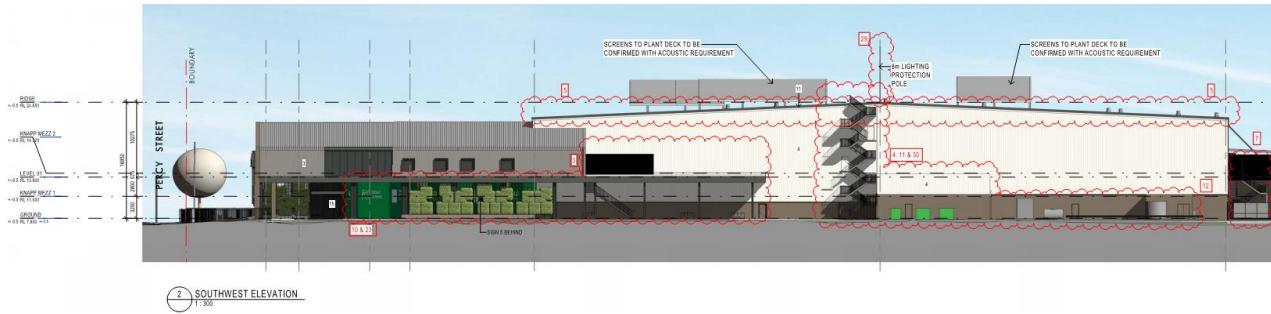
Extract of proposed Southwest Elevation (Source: Nettleton Tribe, 2021)
